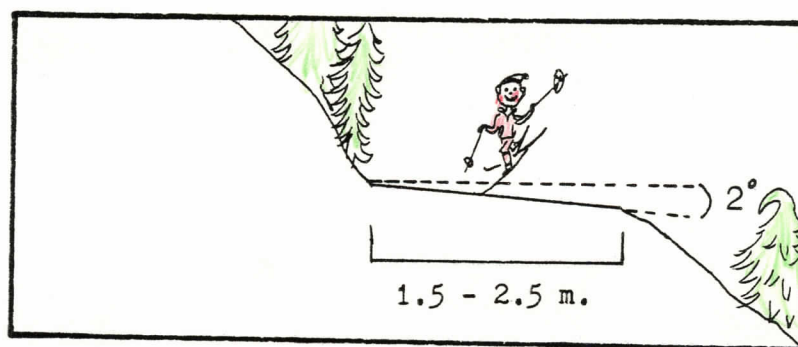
The bench produced should slope 2° to the outside to allow water to drain.
